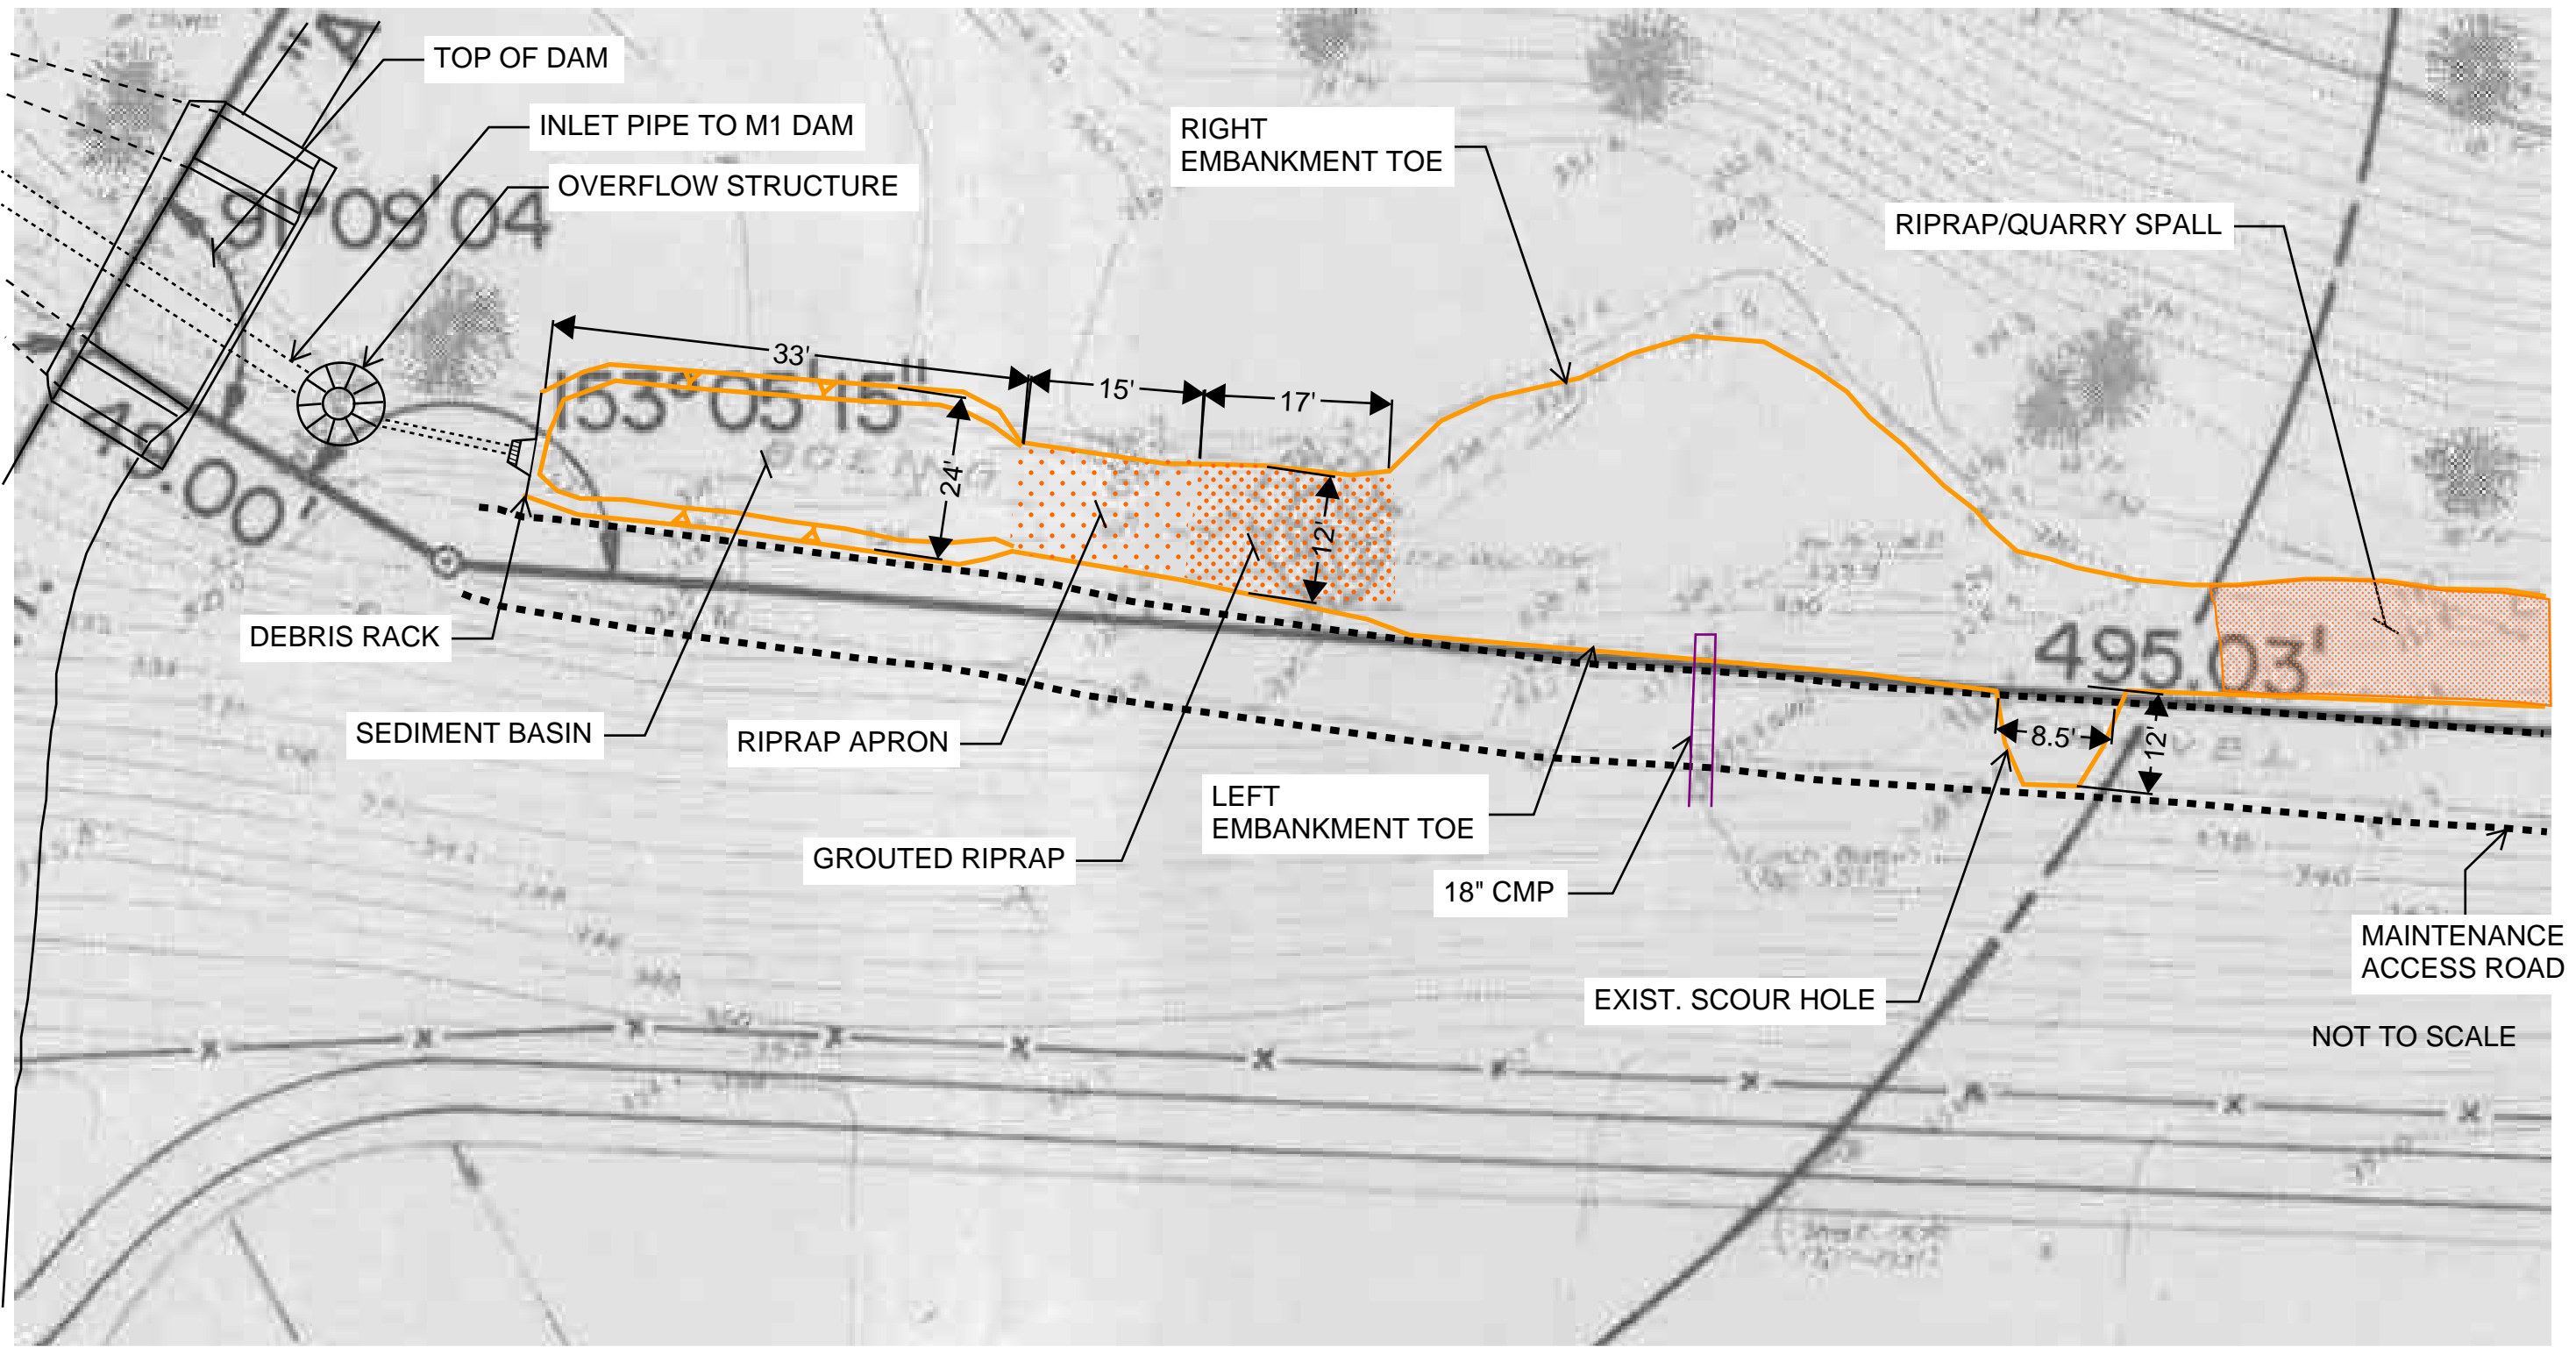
ENLARGED PLAN VIEW AT SCOUR HOLE LOCATION
